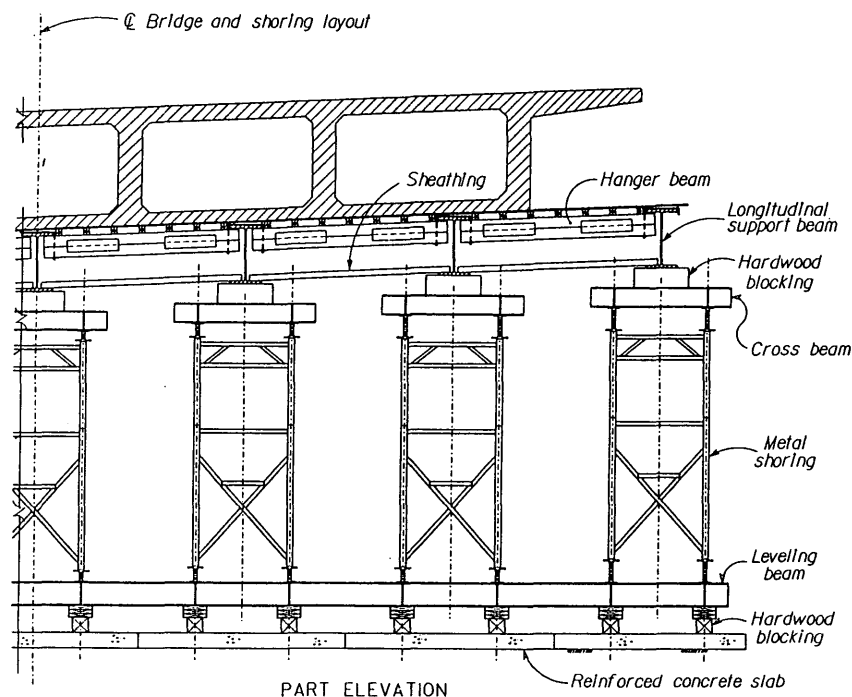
Superstructure construction for concrete girder bridge carrying Maryland Route 198 over Baltimore-Washington Parkway.
